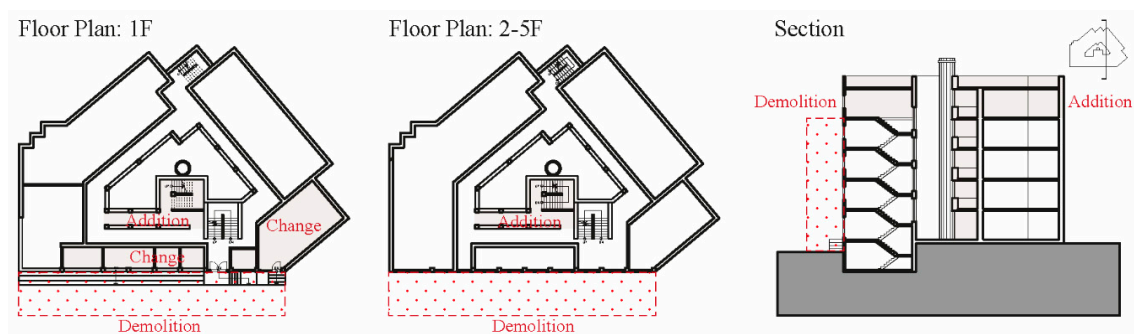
Plans and section of Choongjeong Apartment [49,50] (redrawn by: Author).
